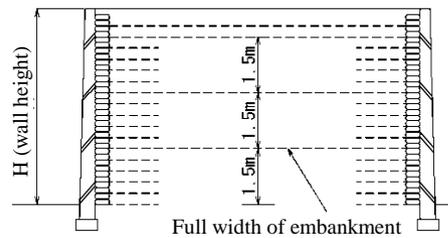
Arrangement when both sides of the embankment are retained by GRS RWs
